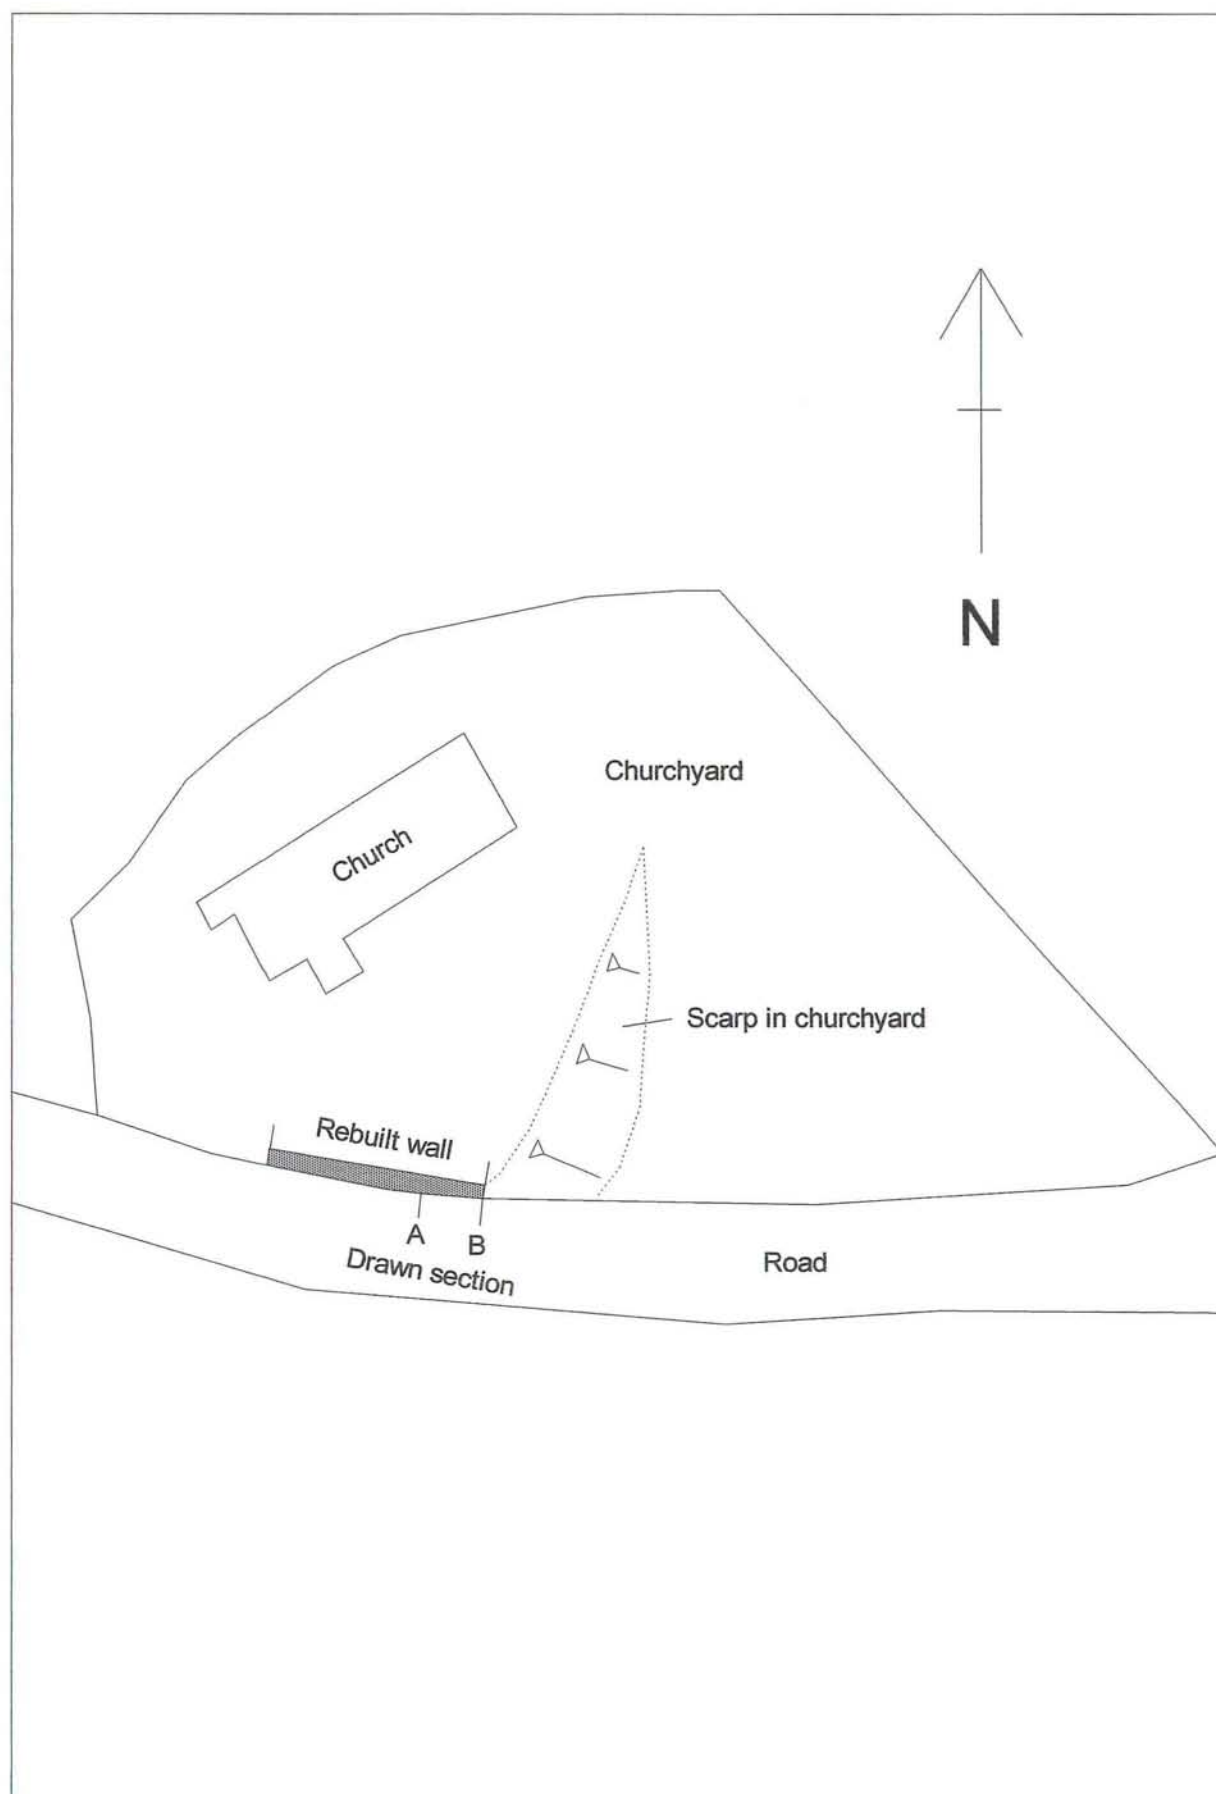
Location of rebuilt wall and drawn section. Scale 1:500
